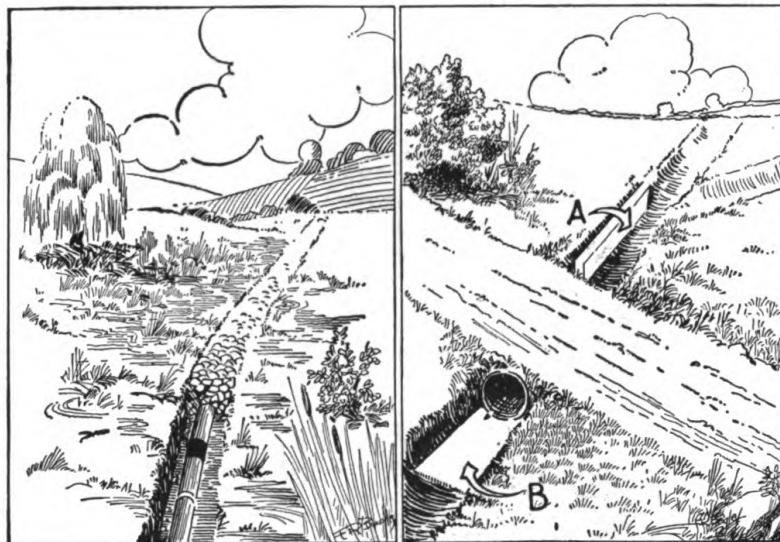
Drainage ditches. A—Showing splash board for ditch junction. B—Showing splash board at ditch junction and culvert under roadway, with concrete slab at downstream end of culvert.
